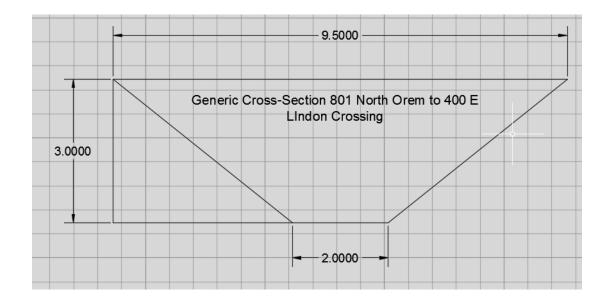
Cross-section 800 North Orem to 400 East Lindon crossing (ft)
